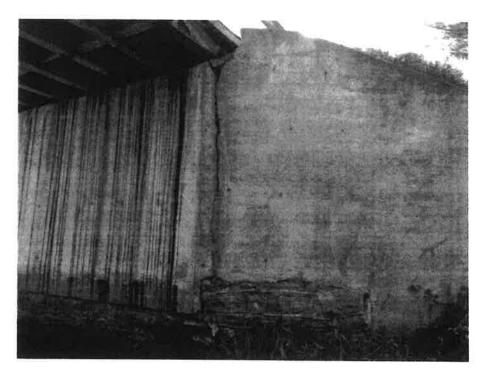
Southwest Corner/West Abutment Large Vertical Crack and Missing Stones
